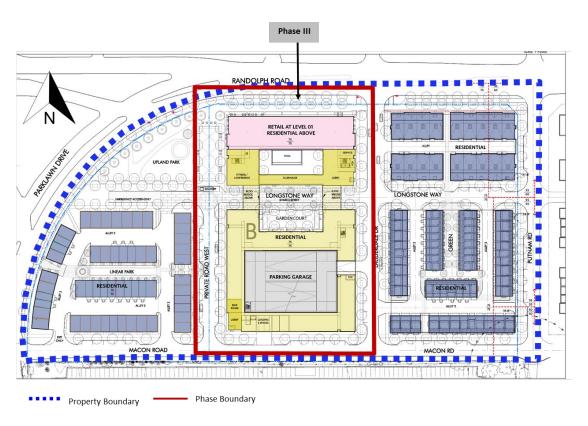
Approved Sketch Plan – Full Buildout in Phase III
